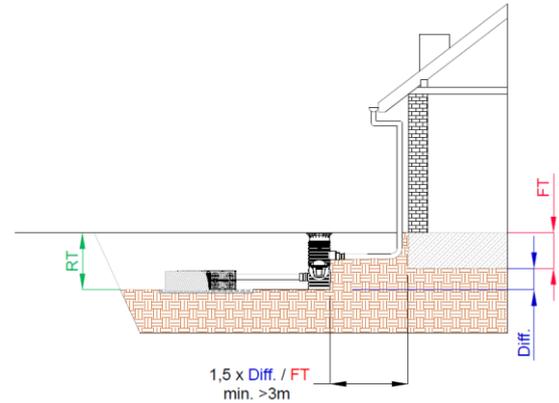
Installation situation: Infiltration ditch module deeper than the foundation
